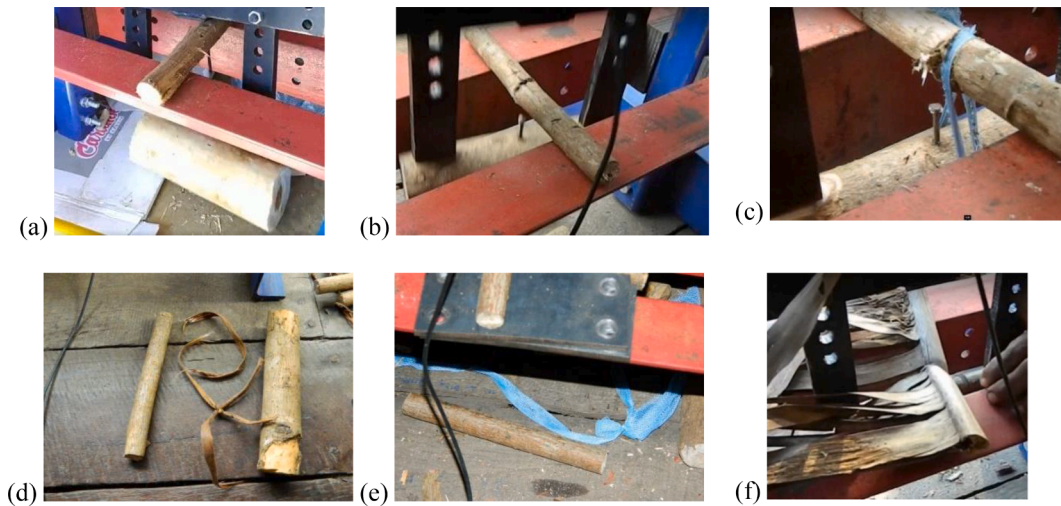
Observed failure modes for (a-e) member-member connections failed by rupture of wrapping materials, and for (f) for secondary member-roof-cover connections with petiole failure.
